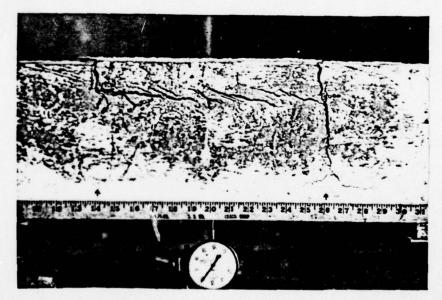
Beam T-4-P at failure. Ultimate load = 7.75 kpj. Splice length = 12 inches. Note the disposition of the side splitting cracks.
